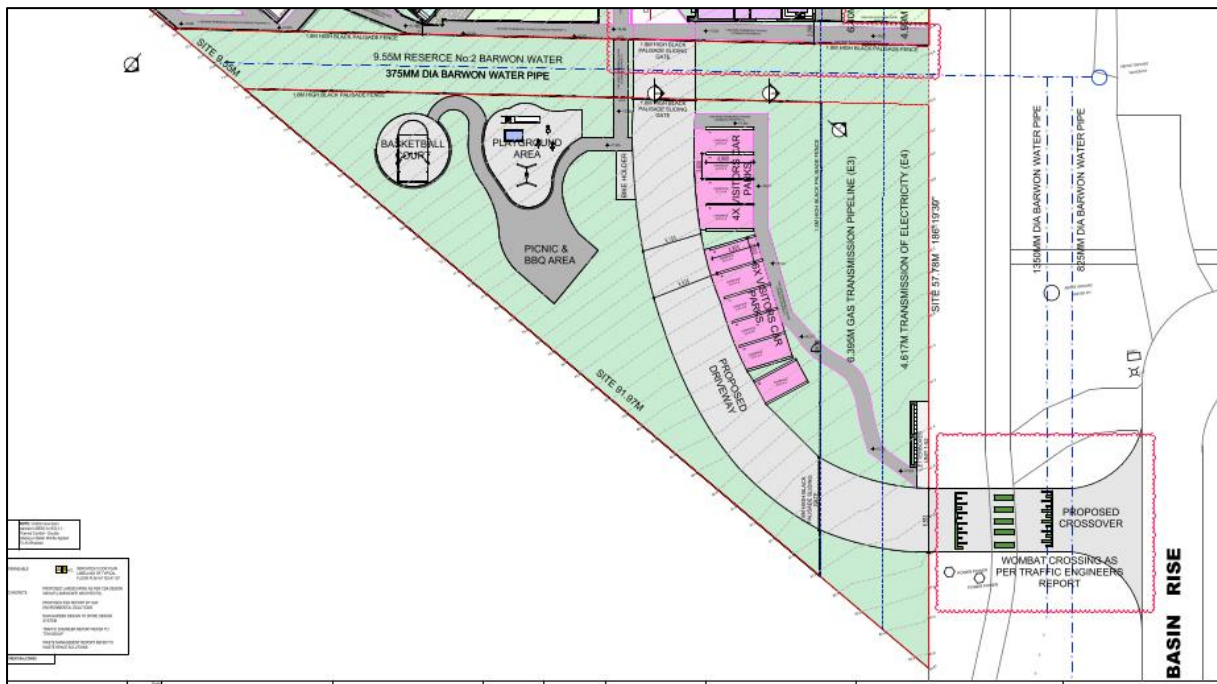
The proposed Basin Rise access to the upper part of the site showing visitor parking and communal recreation facilities. Access from Basin Rise is proposed over land owned by Barwon Water to be constructed with a wombat crossing at the intersection with the pipeline track. Source: Application documents.
